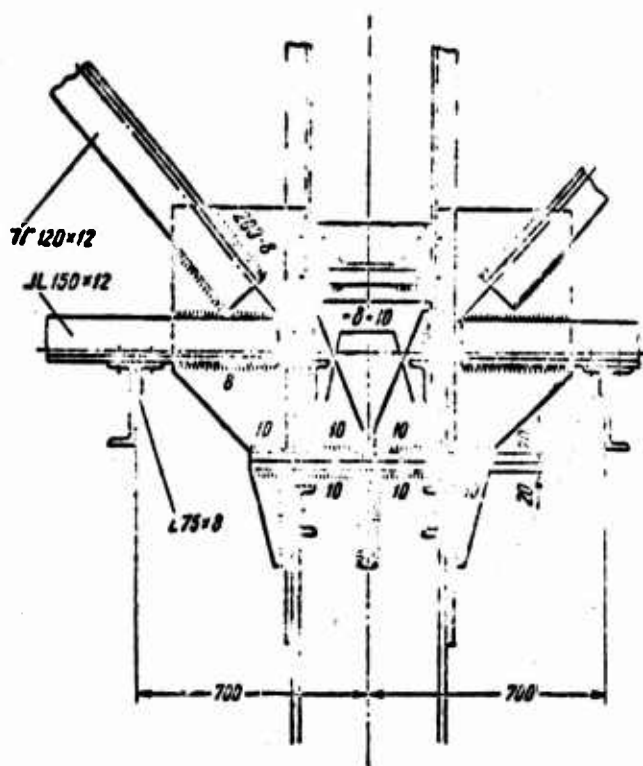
The supporting joints of the horizontal trusses of the gallery.
